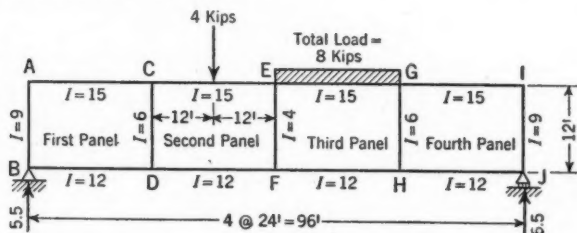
FOUR-PANEL OPEN-WEB TRUSS
